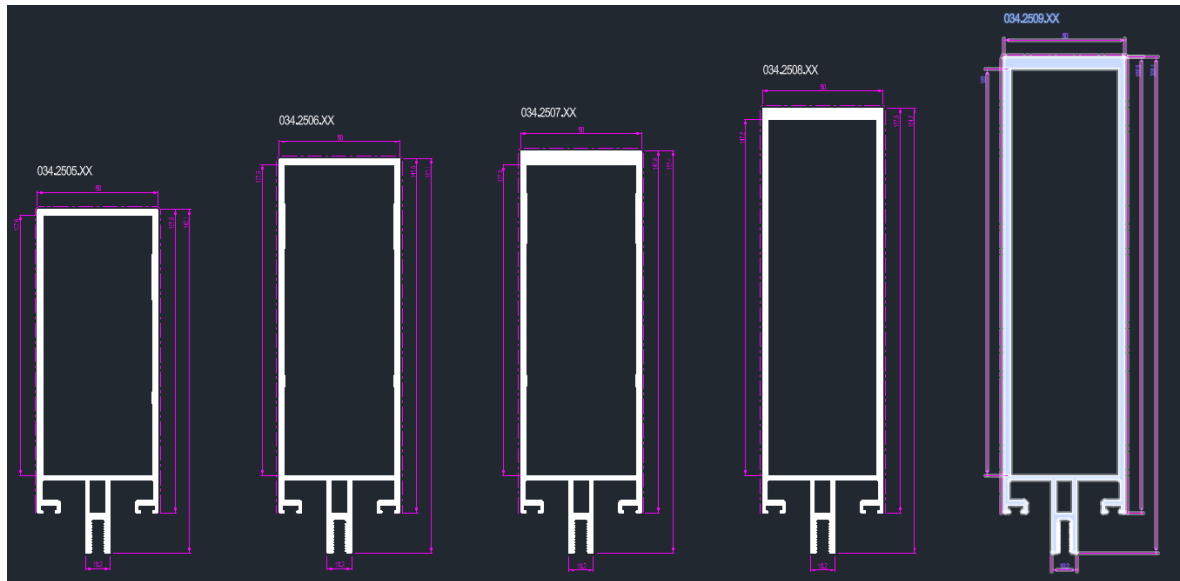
3: Example of detailed mullion sections for 50 mm profiles (source: *cw_50_60_architect_overview.dwg*)
